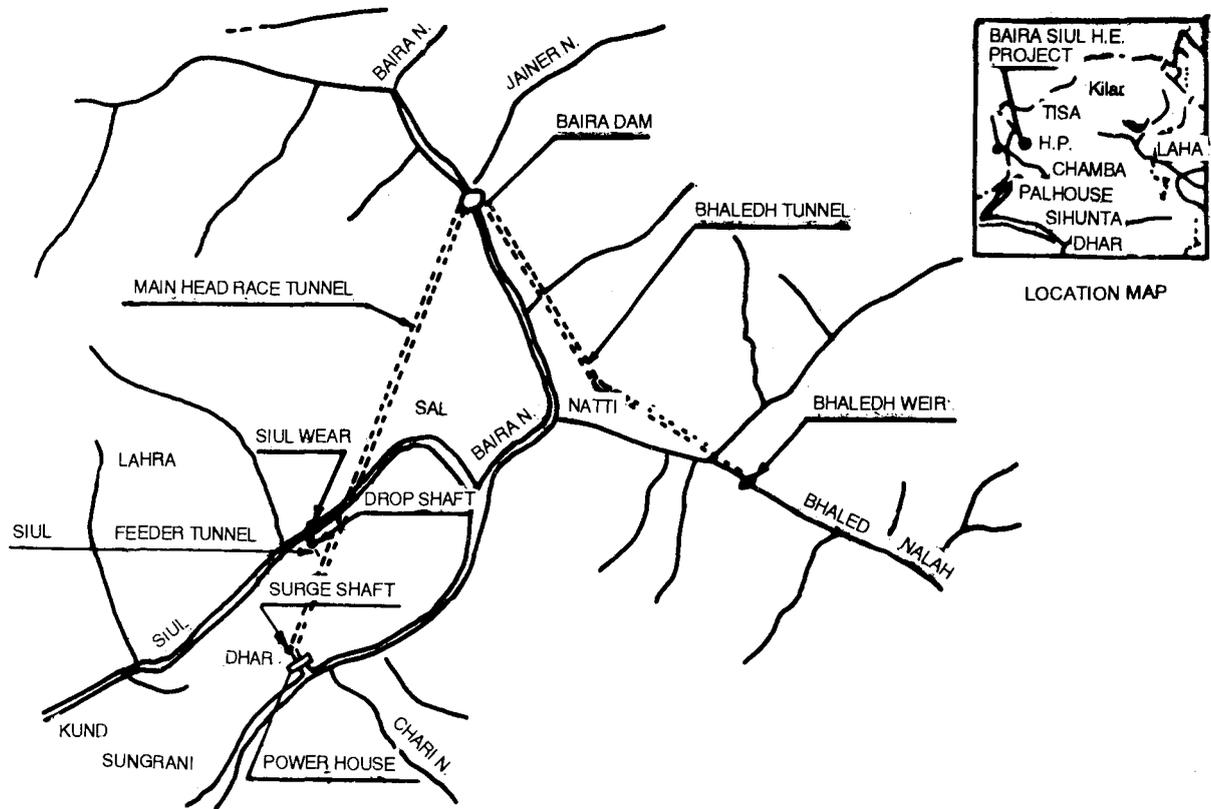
Layout plan of Baira Siul Hydro-electric Project
